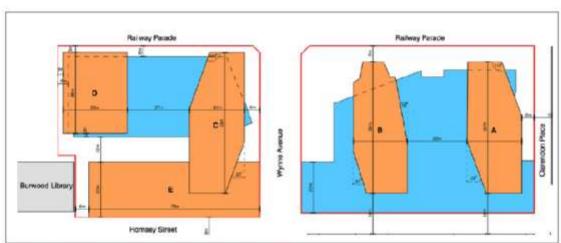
November 2018 Master Plan layout (current Amended PP)
